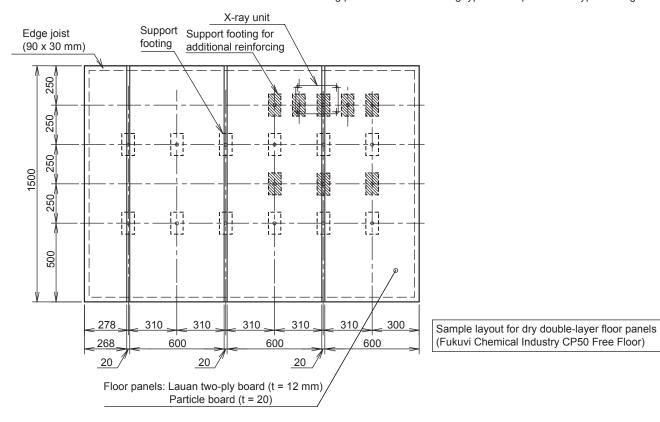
Sample layout for dry double-layer floor panels (wall-mounted)
